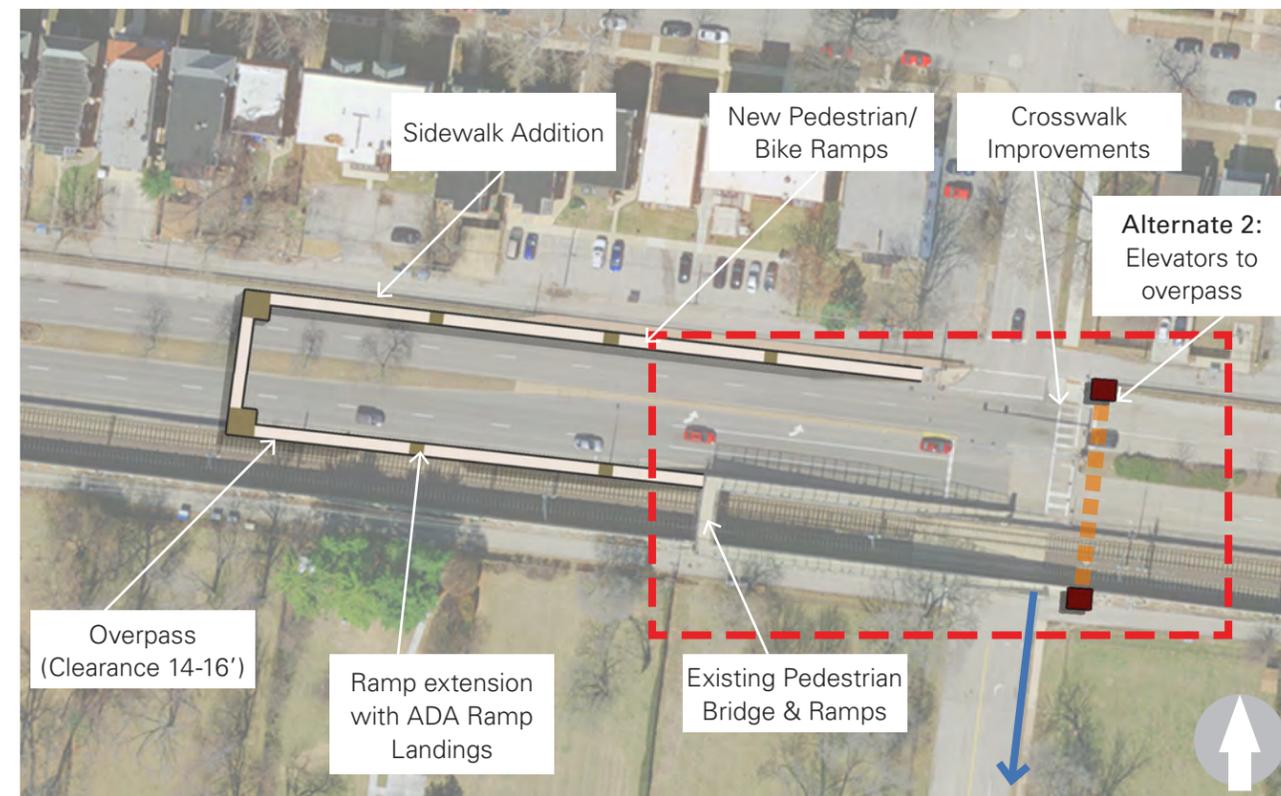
Alternate approaches to improving pedestrian and bike access across Forest Park Parkway at Des Peres: Ramped access or elevators to overpass.
